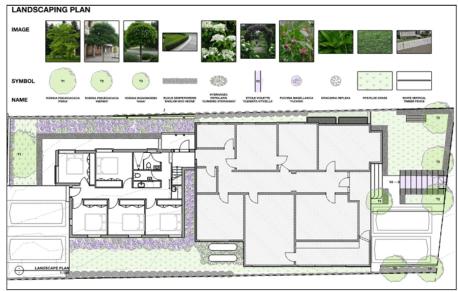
Proposed Landscaping plan (Oramatis, 2020)
